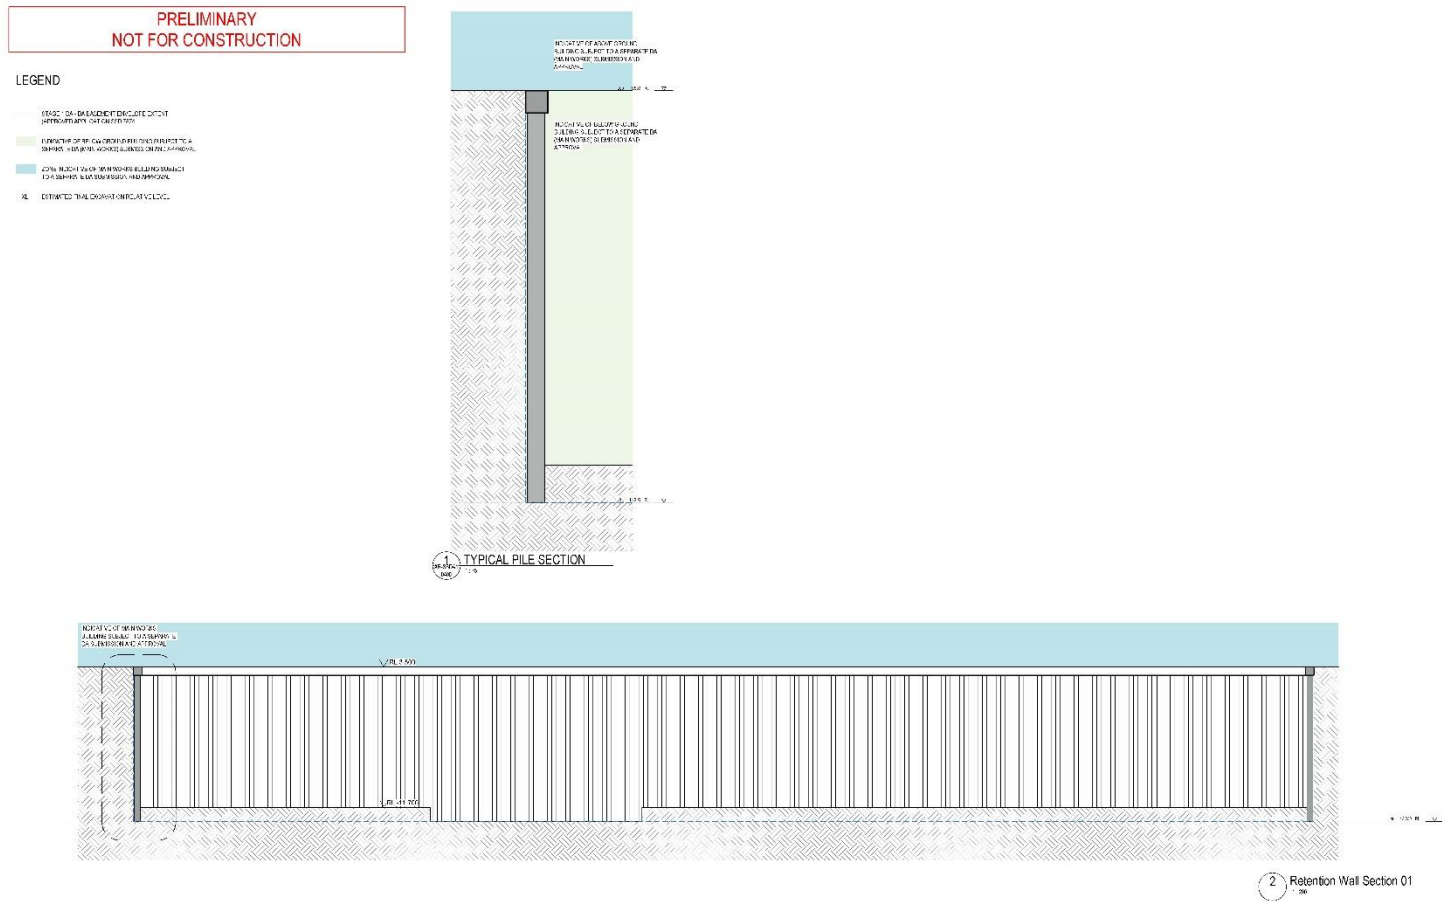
SSDA 1 proposed retention wall elevations. Source. Ethos Urban.
